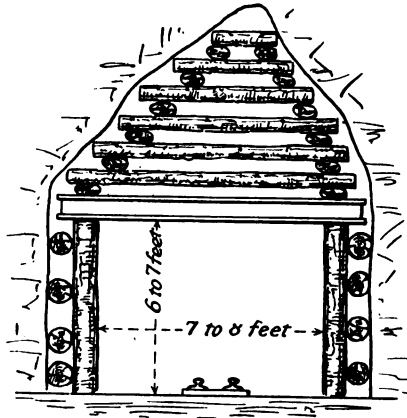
A Mode of supporting the Roof and Sides of a Thick Seam in South Staffordshire.
